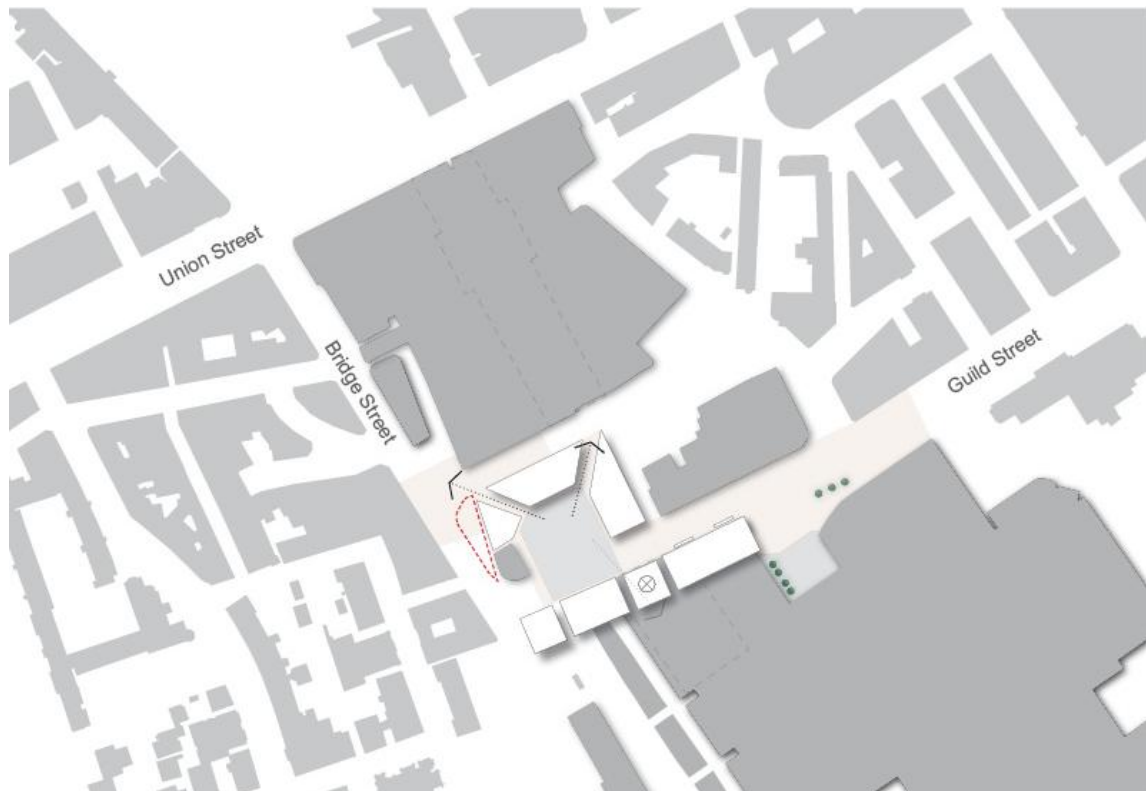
LEVEL 1 - Guild Street / Atholl House (indicative only*)
